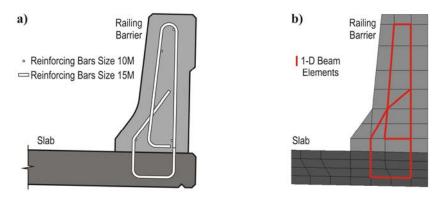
Cross-section of the traffic railing barrier: a) actual object, b) FE model
